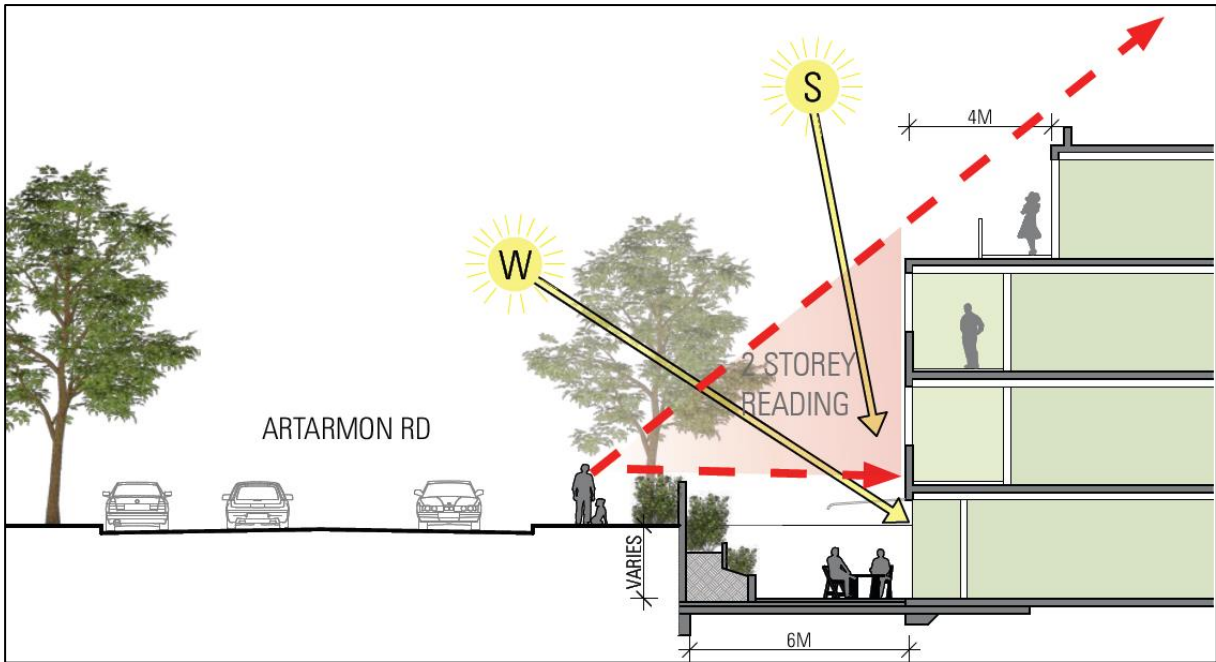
| Building A street scale diagram (Source: Proponent's EA)
